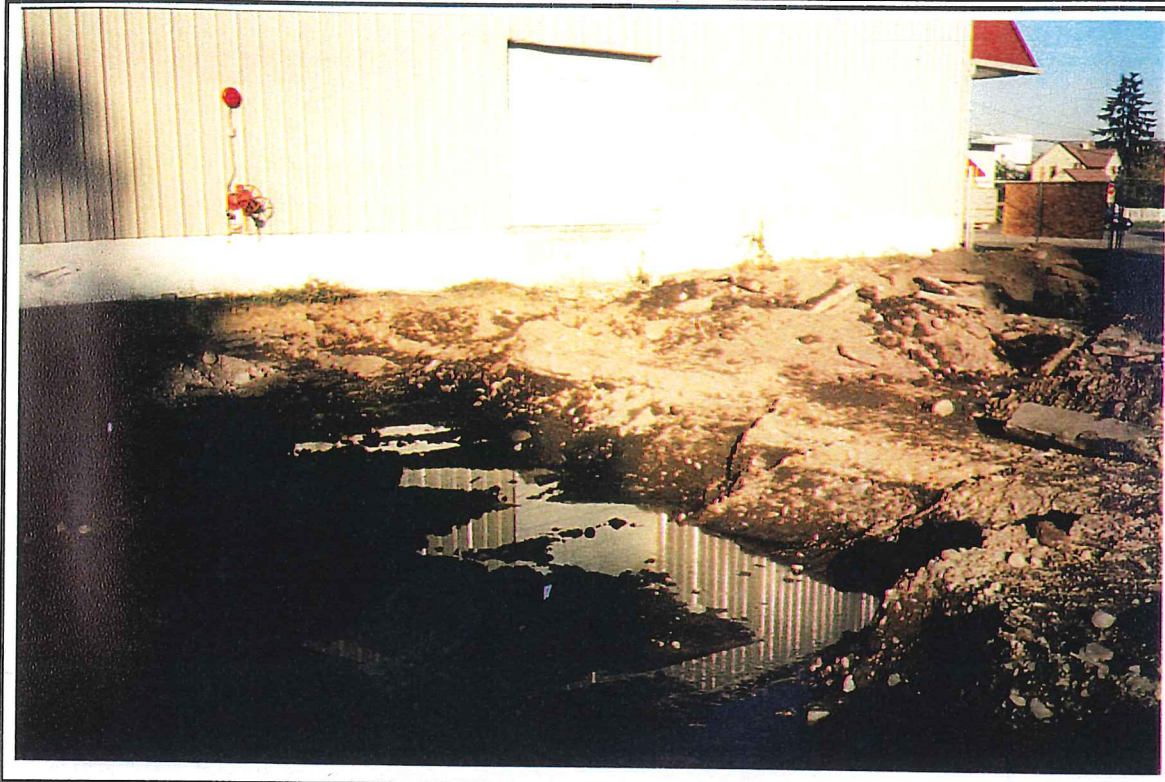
View of contaminated fill material in stockpile #4 prior to loading and transporting to TPS Technologies, Inc. for disposal, facing east. Photo taken on 12/20/01.
